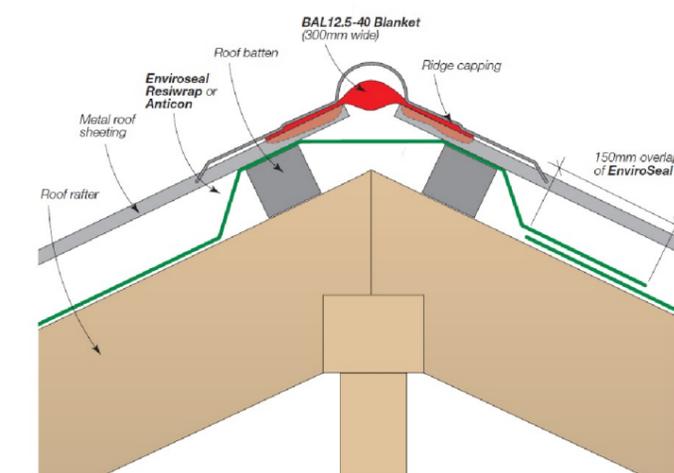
Hip/Ridge Detail – Steel Roof (BAL-12.5 – BAL-40)
